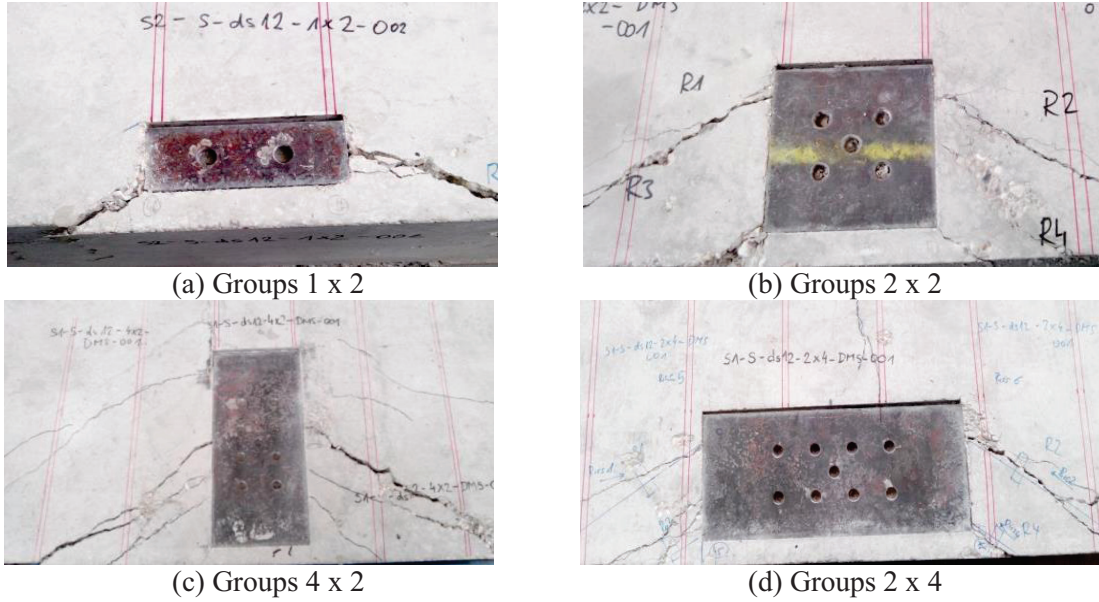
Typical failure modes obtained by the tests on anchor groups tested in concrete with stirrups of 12 mm diameter
